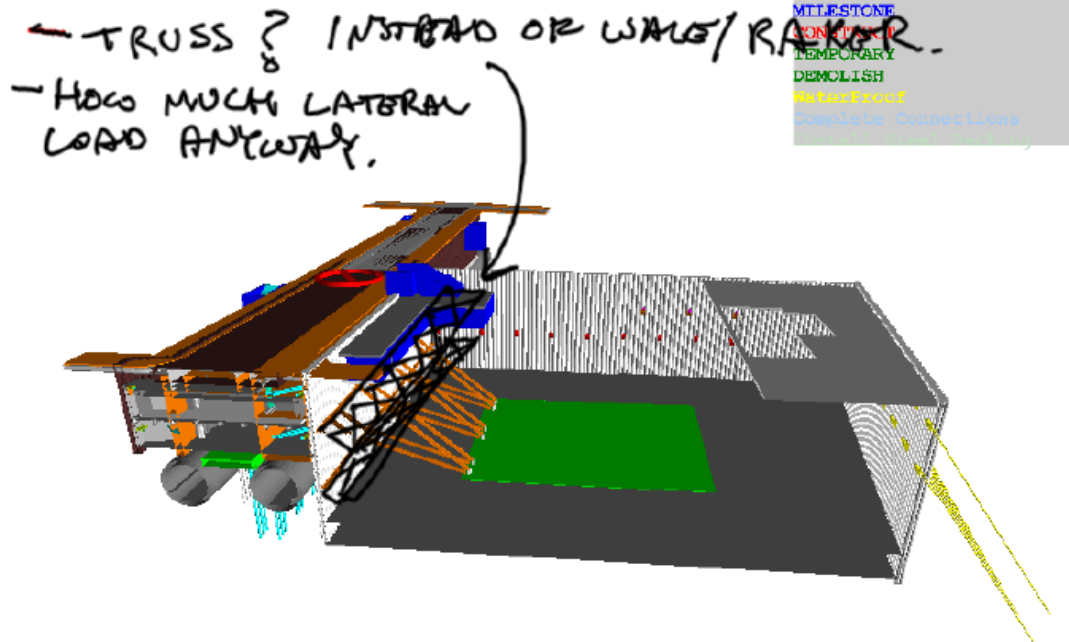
This example shows how the CCM team used the 4D system to design the temporary supports for an excavation pit. The CCM team used the 4D model to make the decision that it is possible to support one side of the excavation pit with a truss instead of using tiebacks. The CCM team hoped that a support with a truss would be beneficial for the work in the excavation pit because the tiebacks' supports would require space within the pit.
